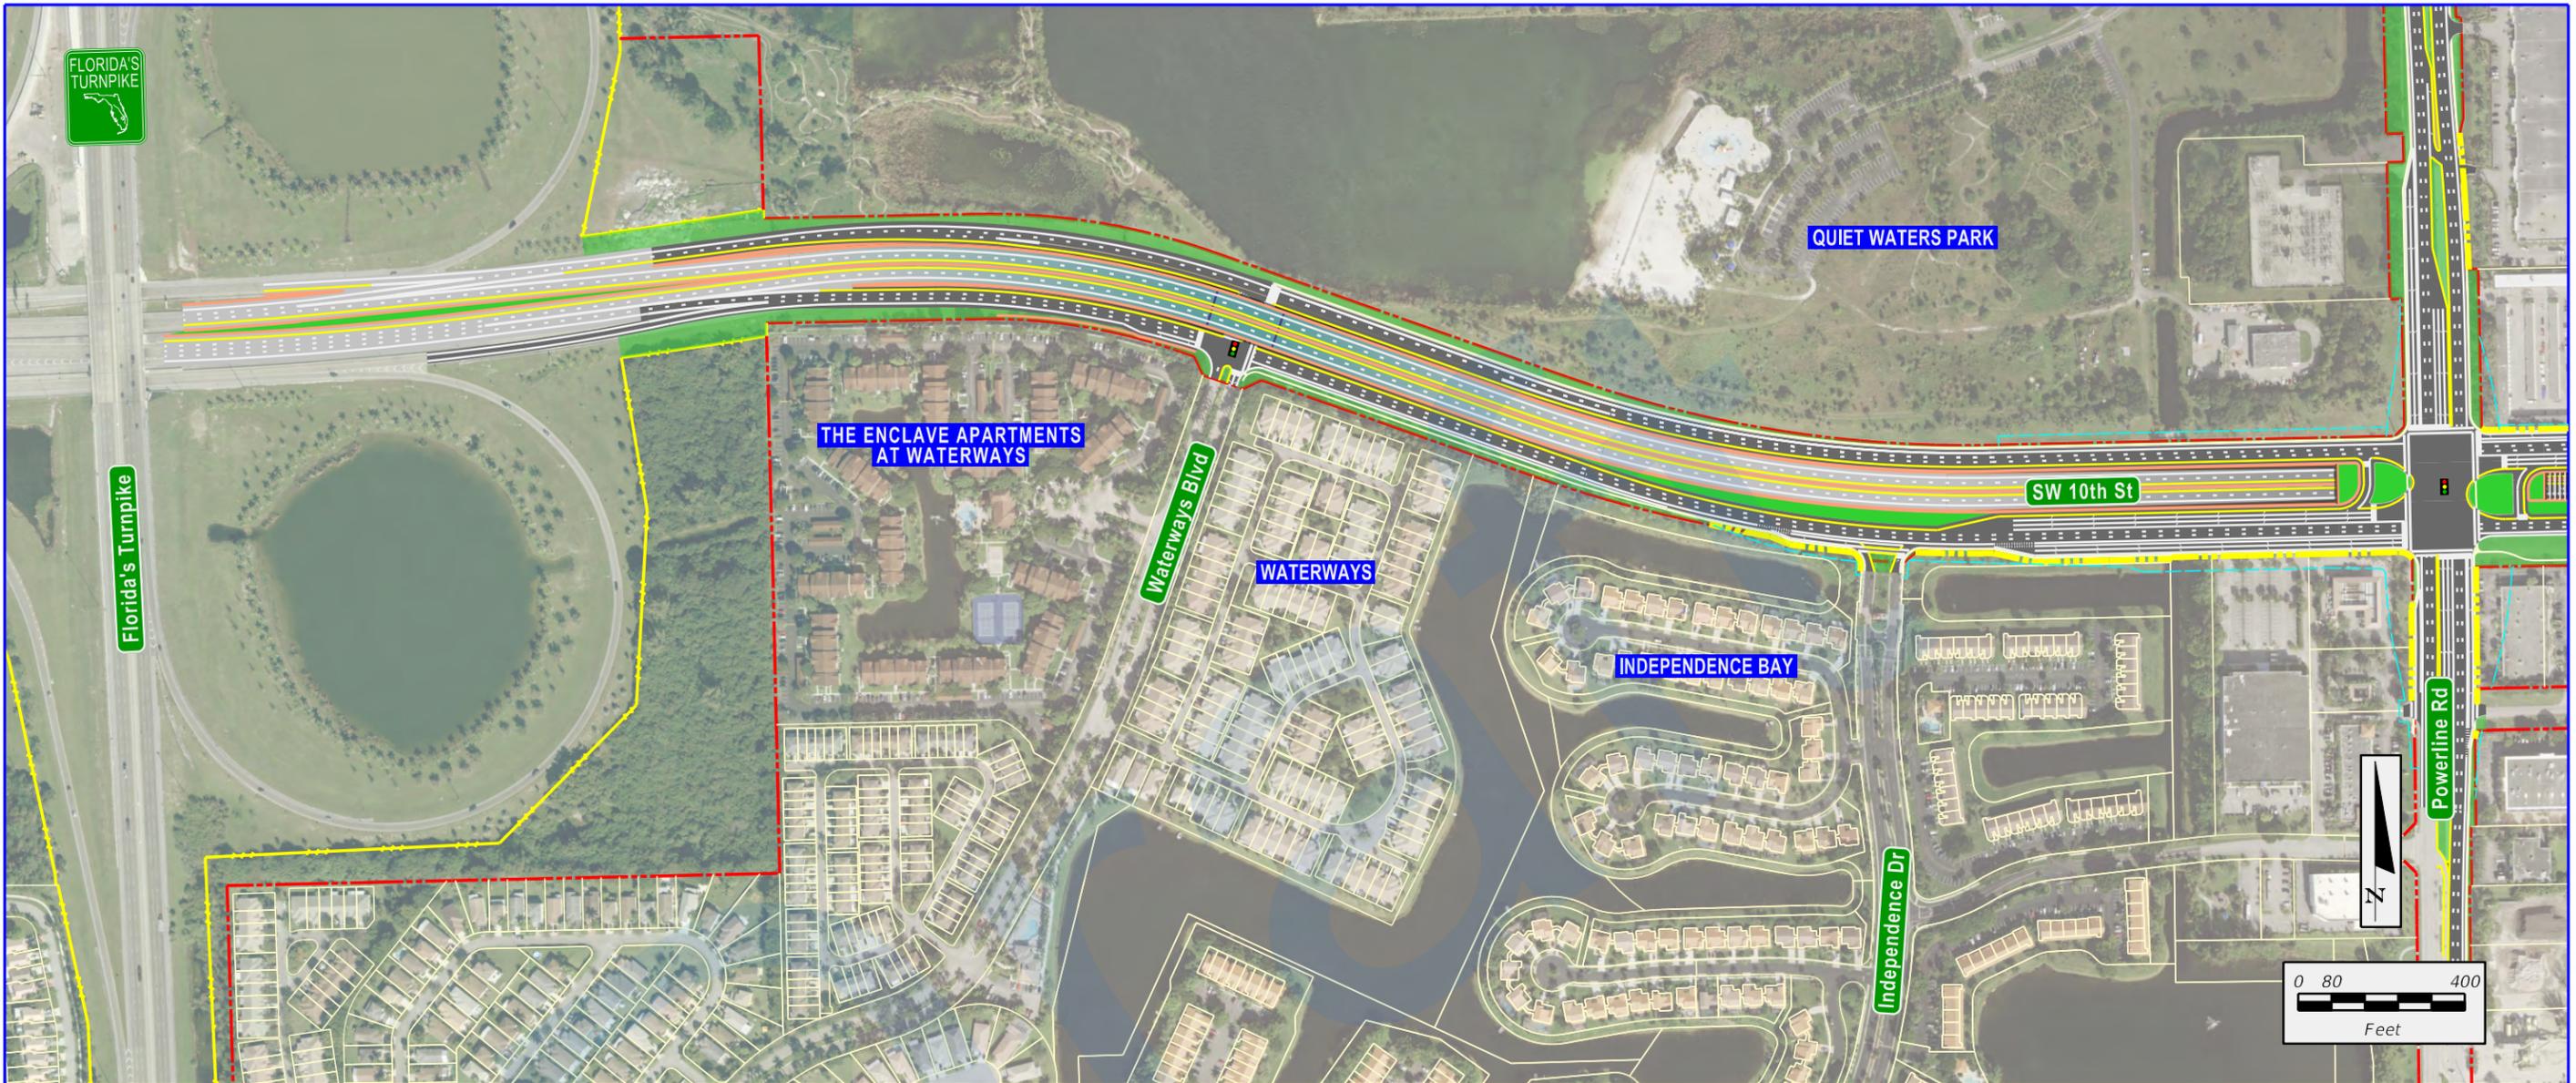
provides a three-sheet plan and profile overview of the Center Alternative. More detailed drawings can be found in Appendix A. The color gradients on the pavement convey that the profile is in transition. Figures 4.5.10 through 4.5.13 provide three dimensional views of the Center Alternative, which were presented to the public on April 24, 2018 at Public Alternatives Workshop #1. The next section describes the North Alternative, which is compared to the Center Alternative in an evaluation matrix in Section 4.5.3.
